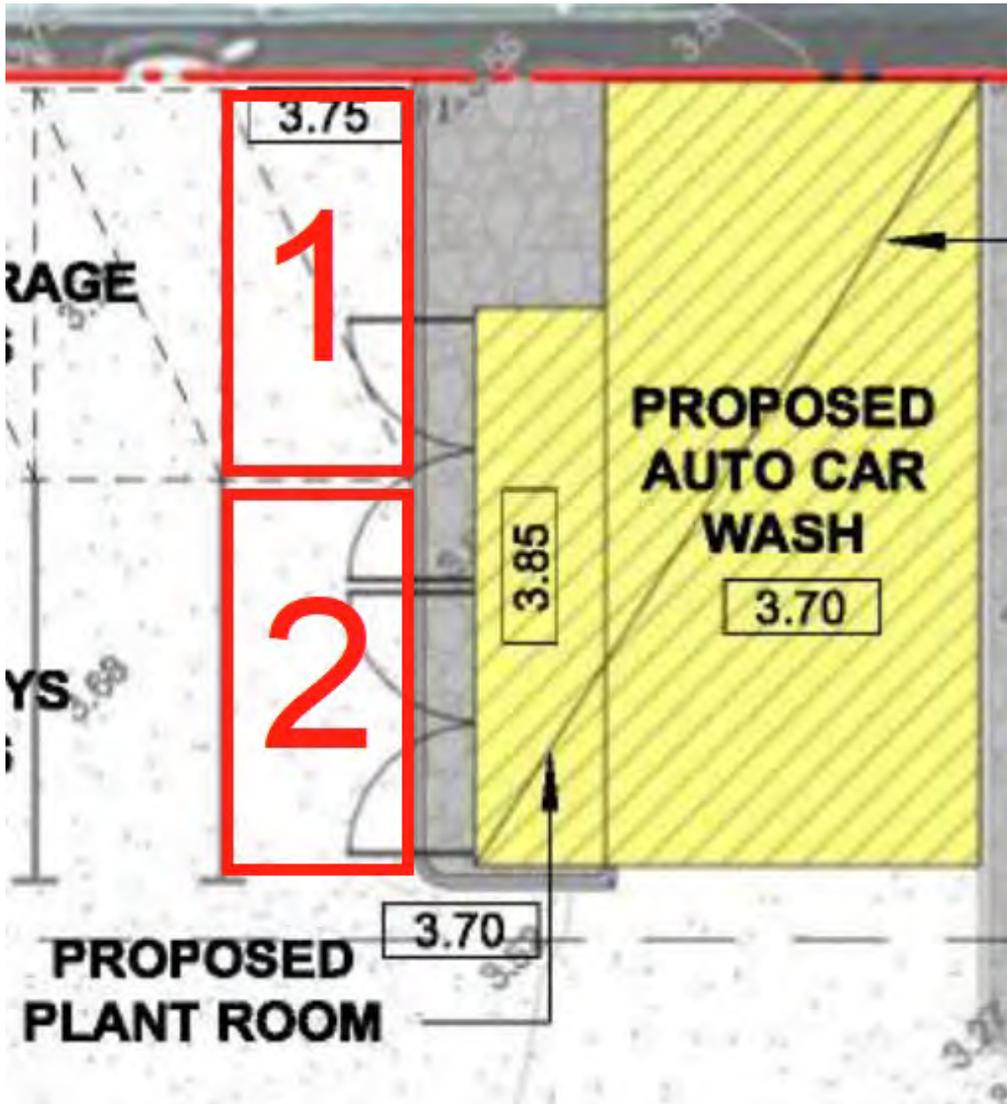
Shows the two car bays adjacent to the plant room (red outline and marked 1 and 2) that are required to be free of obstruction to meet Australian Standards for parking facilities.
